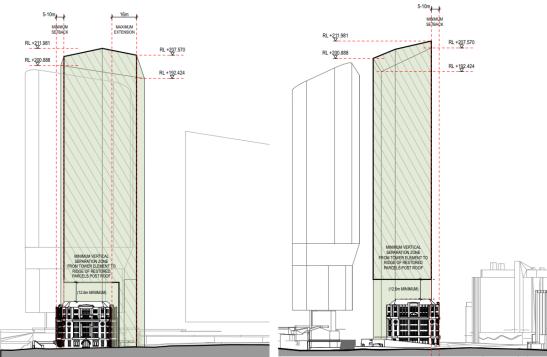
Maximum Block C envelope (Left: West Elevation; Right: North Elevation)
